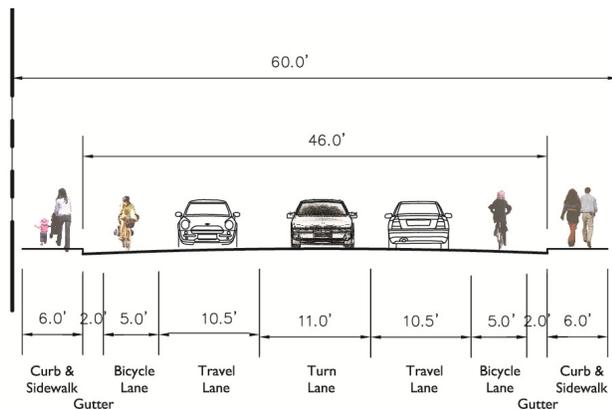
OLIVEHURST AVENUE PROPOSED SECTION SOUTH OF EIGHTH AVENUE
